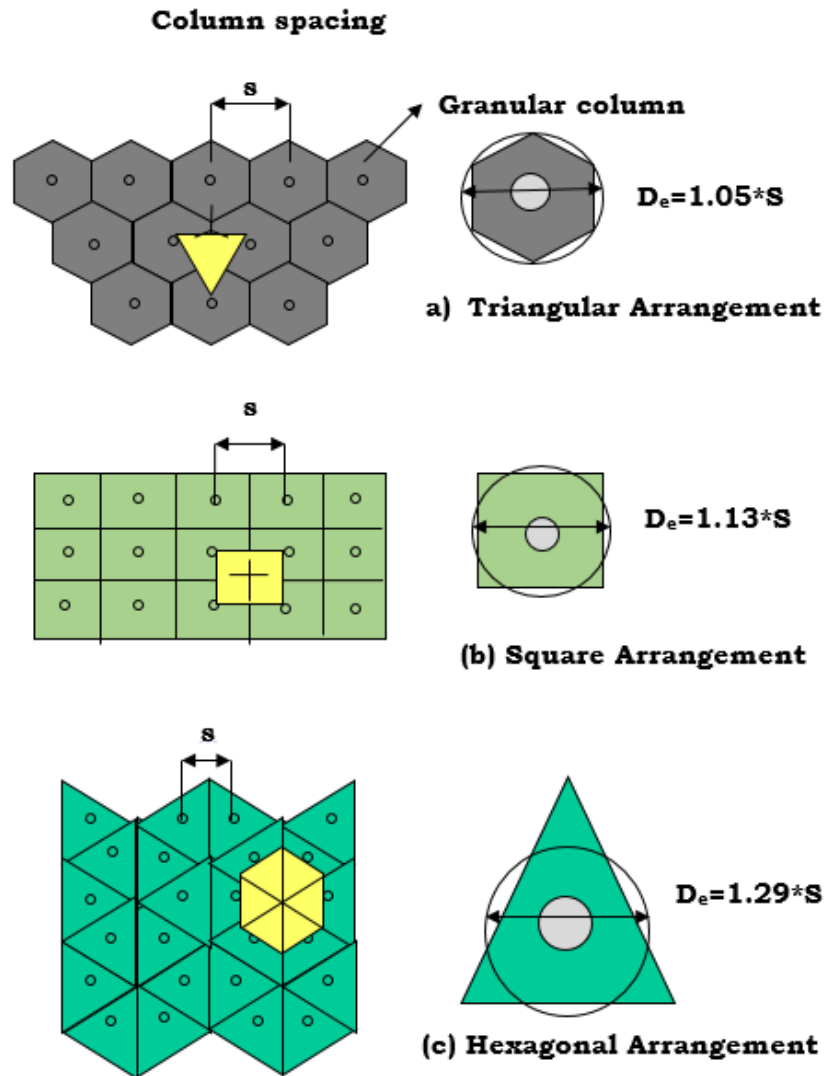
Different Plan arrangements of granular column – Balaam and Booker [19]
